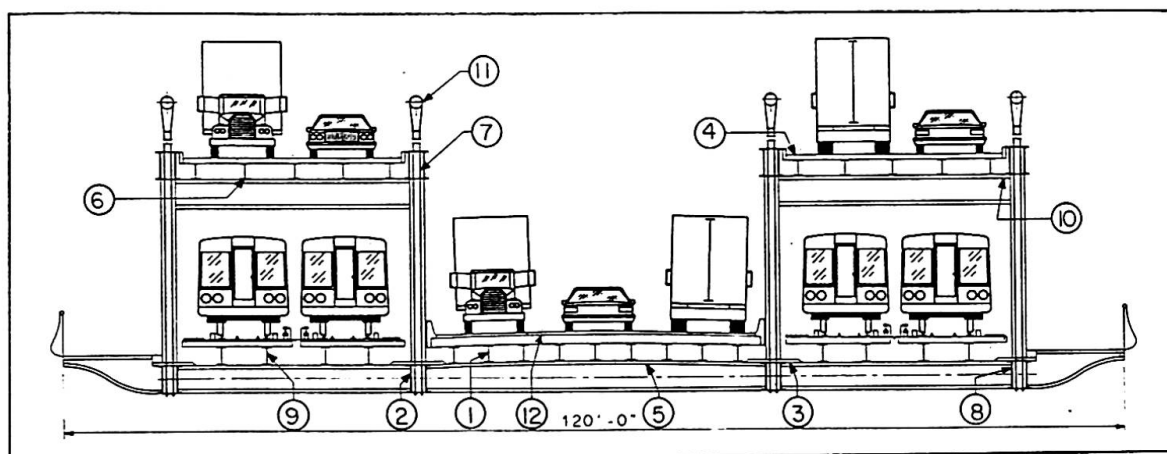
CROSS SECTION OF MANHATTAN BRIDGE, NEW YORK - Major Defects Reported
